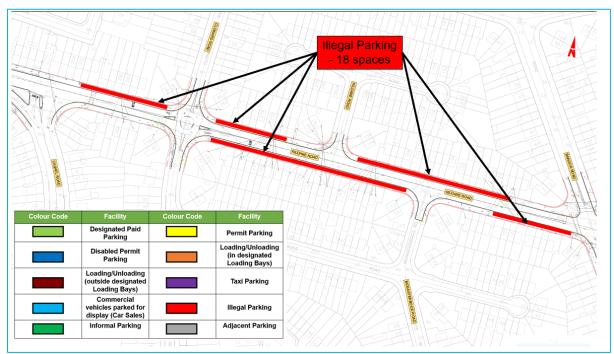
Locations of Informal Parking Kildare Road Section 2
